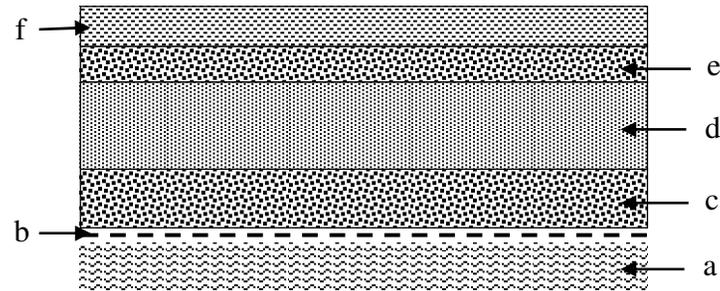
The hydraulic barrier course is covered with the original soil material from the site
